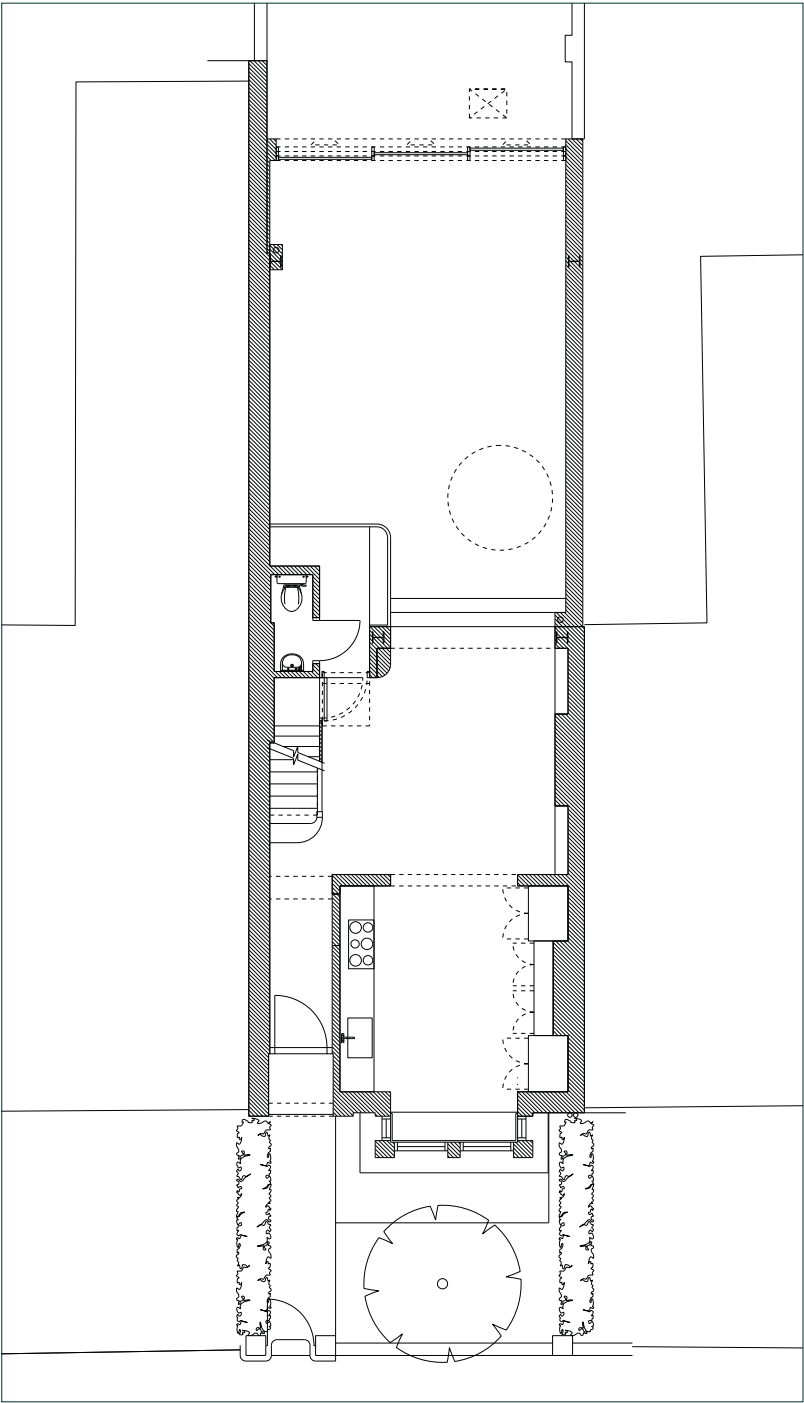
Proposed Ground Floor Plan of 11 Raveley Street.
